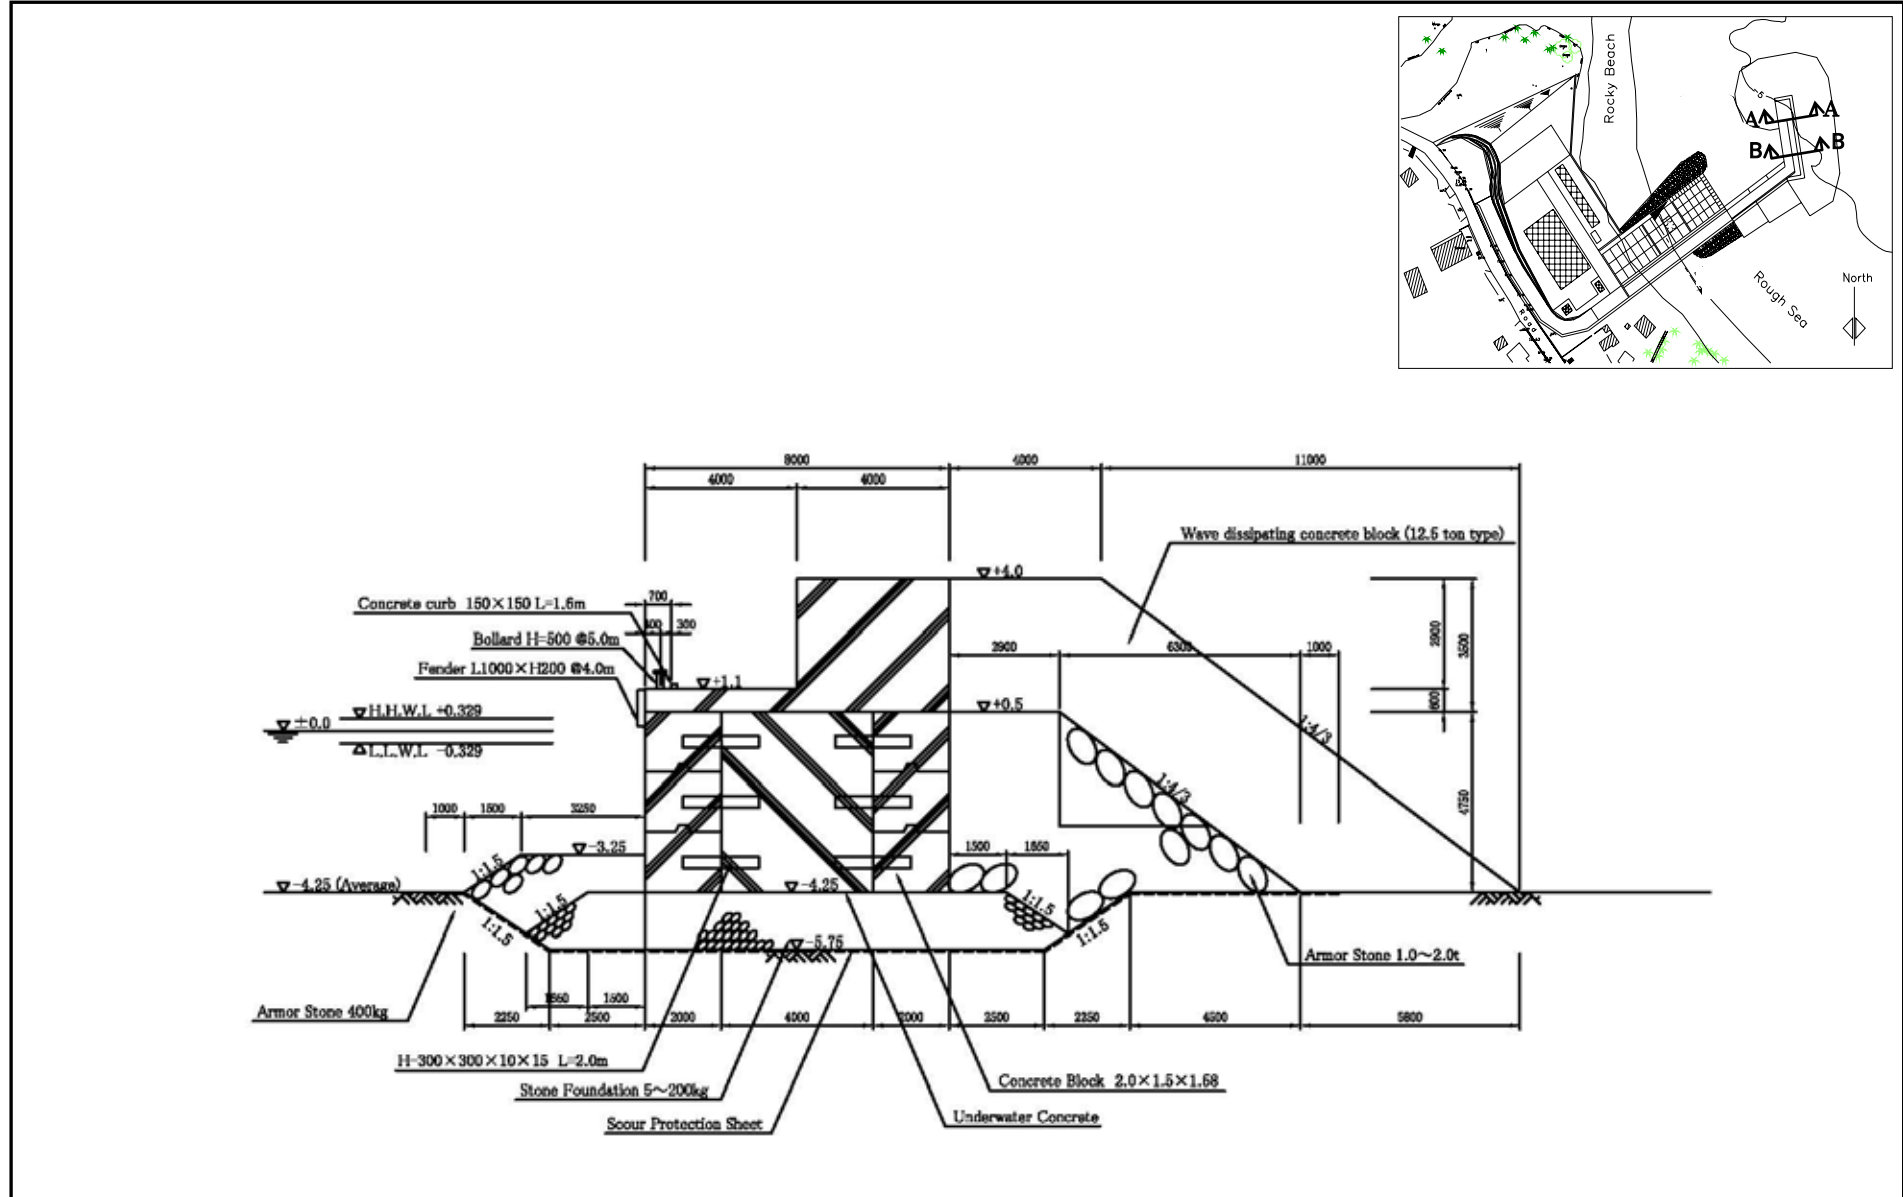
(3) Cross Section for Breakwater (Section B-B)
